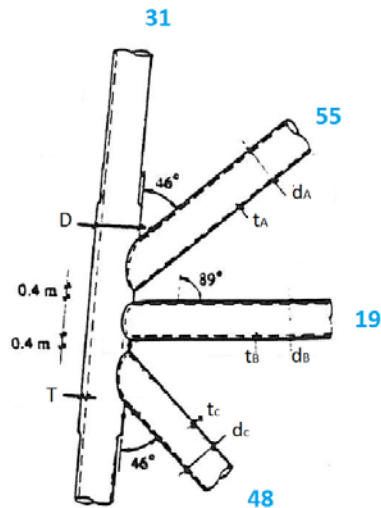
Detail view of tubular joint 13 in ZX-plane ref.[2]
